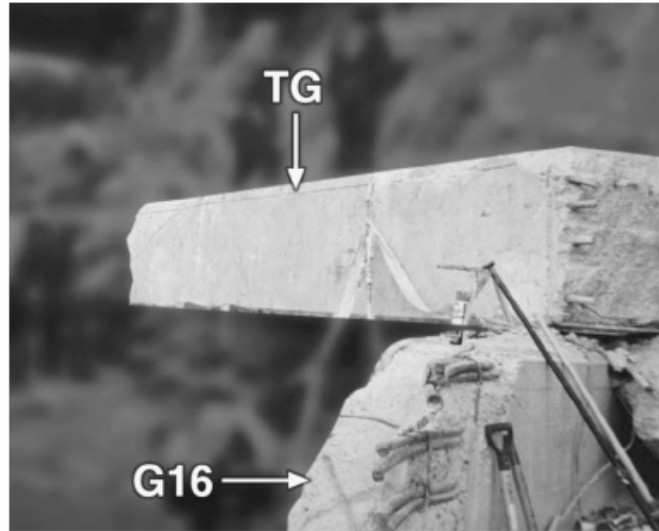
Failure of Connection Between Transfer Girder and Column in Alfred Murrah Building. [Osteraas (2006)]
